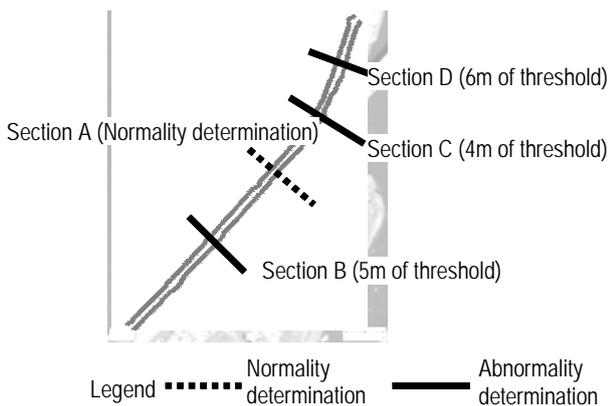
Damaged locations where lateral profiles were made
